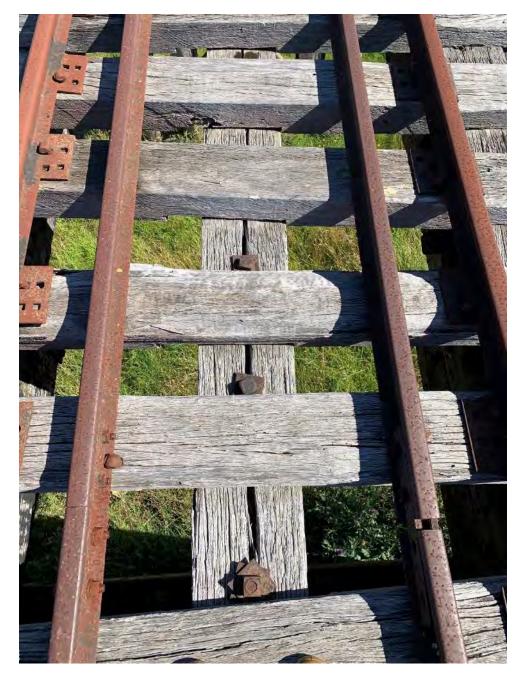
Top view of bridge surface, found to be in poor to very poor condition due to major vertical crack through the middle girder and major decay present in all other girder lengths. Vertical connections expose the bright wood to weathering and funnel watering, this leads to accelerated decay and higher moisture content. Transoms appear to be in fair to poor condition with no major decay or defects present. Note the smaller guard inner guard rail on this open deck railway bridge
